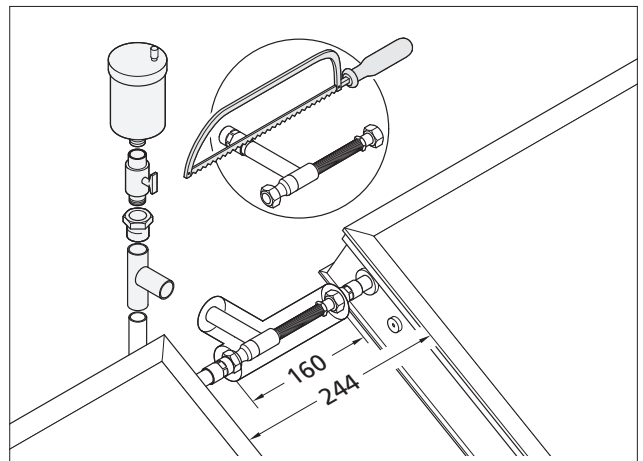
Installation dimensions for connection set prod. no. 190 202 30; Cut to size for compression or solder connections.
